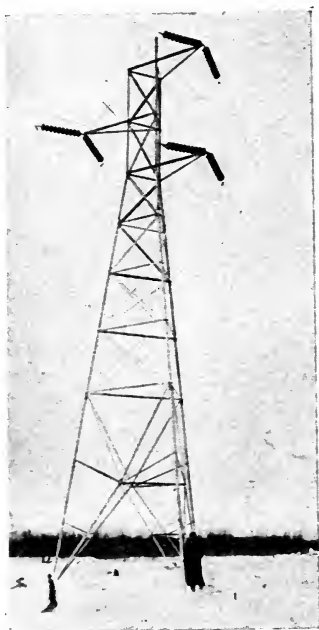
Corner tower—140,000 volt line of Au Sable Power Co.
